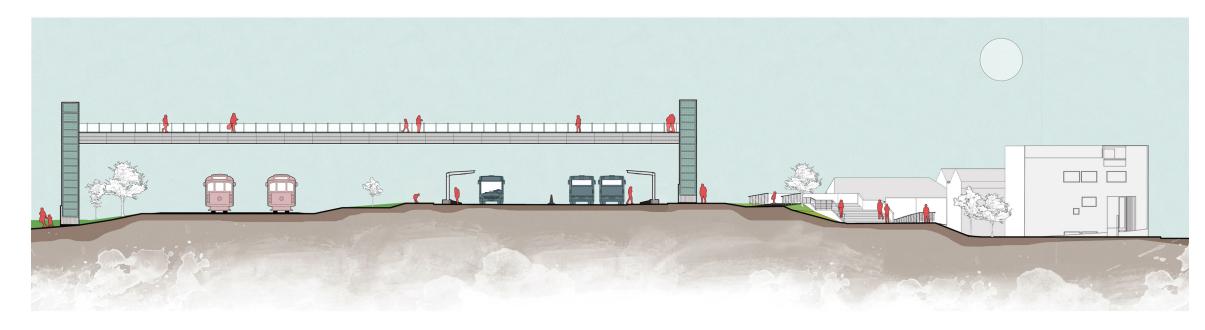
Cross Section Showing a Potential Bridge Over the Busway and Railroad
